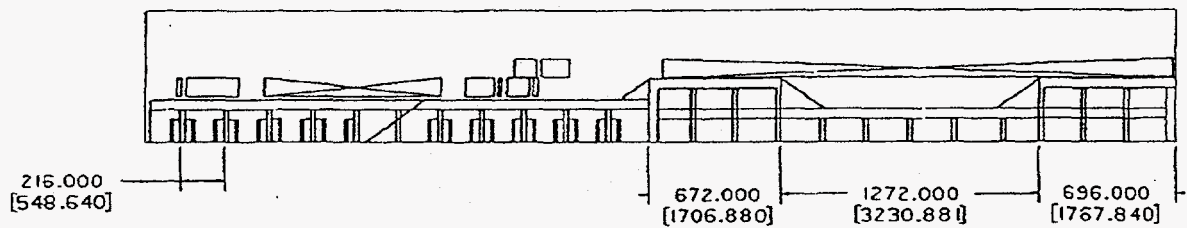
A Side View of the Laser and Target Area Building Shows Three Floor Levels
